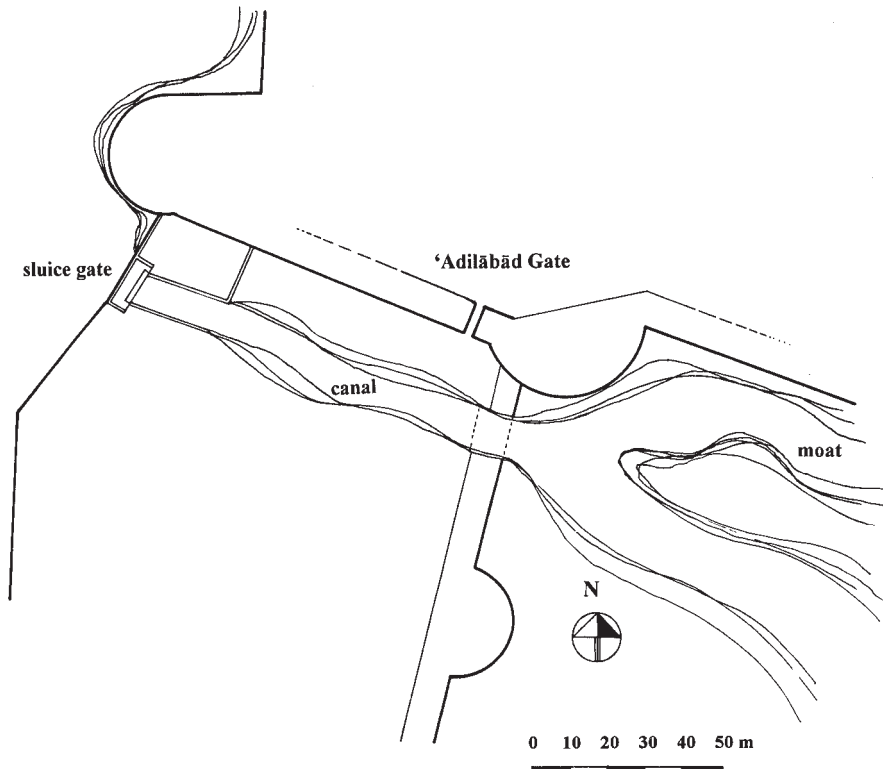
The sluice gate and dam for the lake south of Tughluqabad. Site plan.
